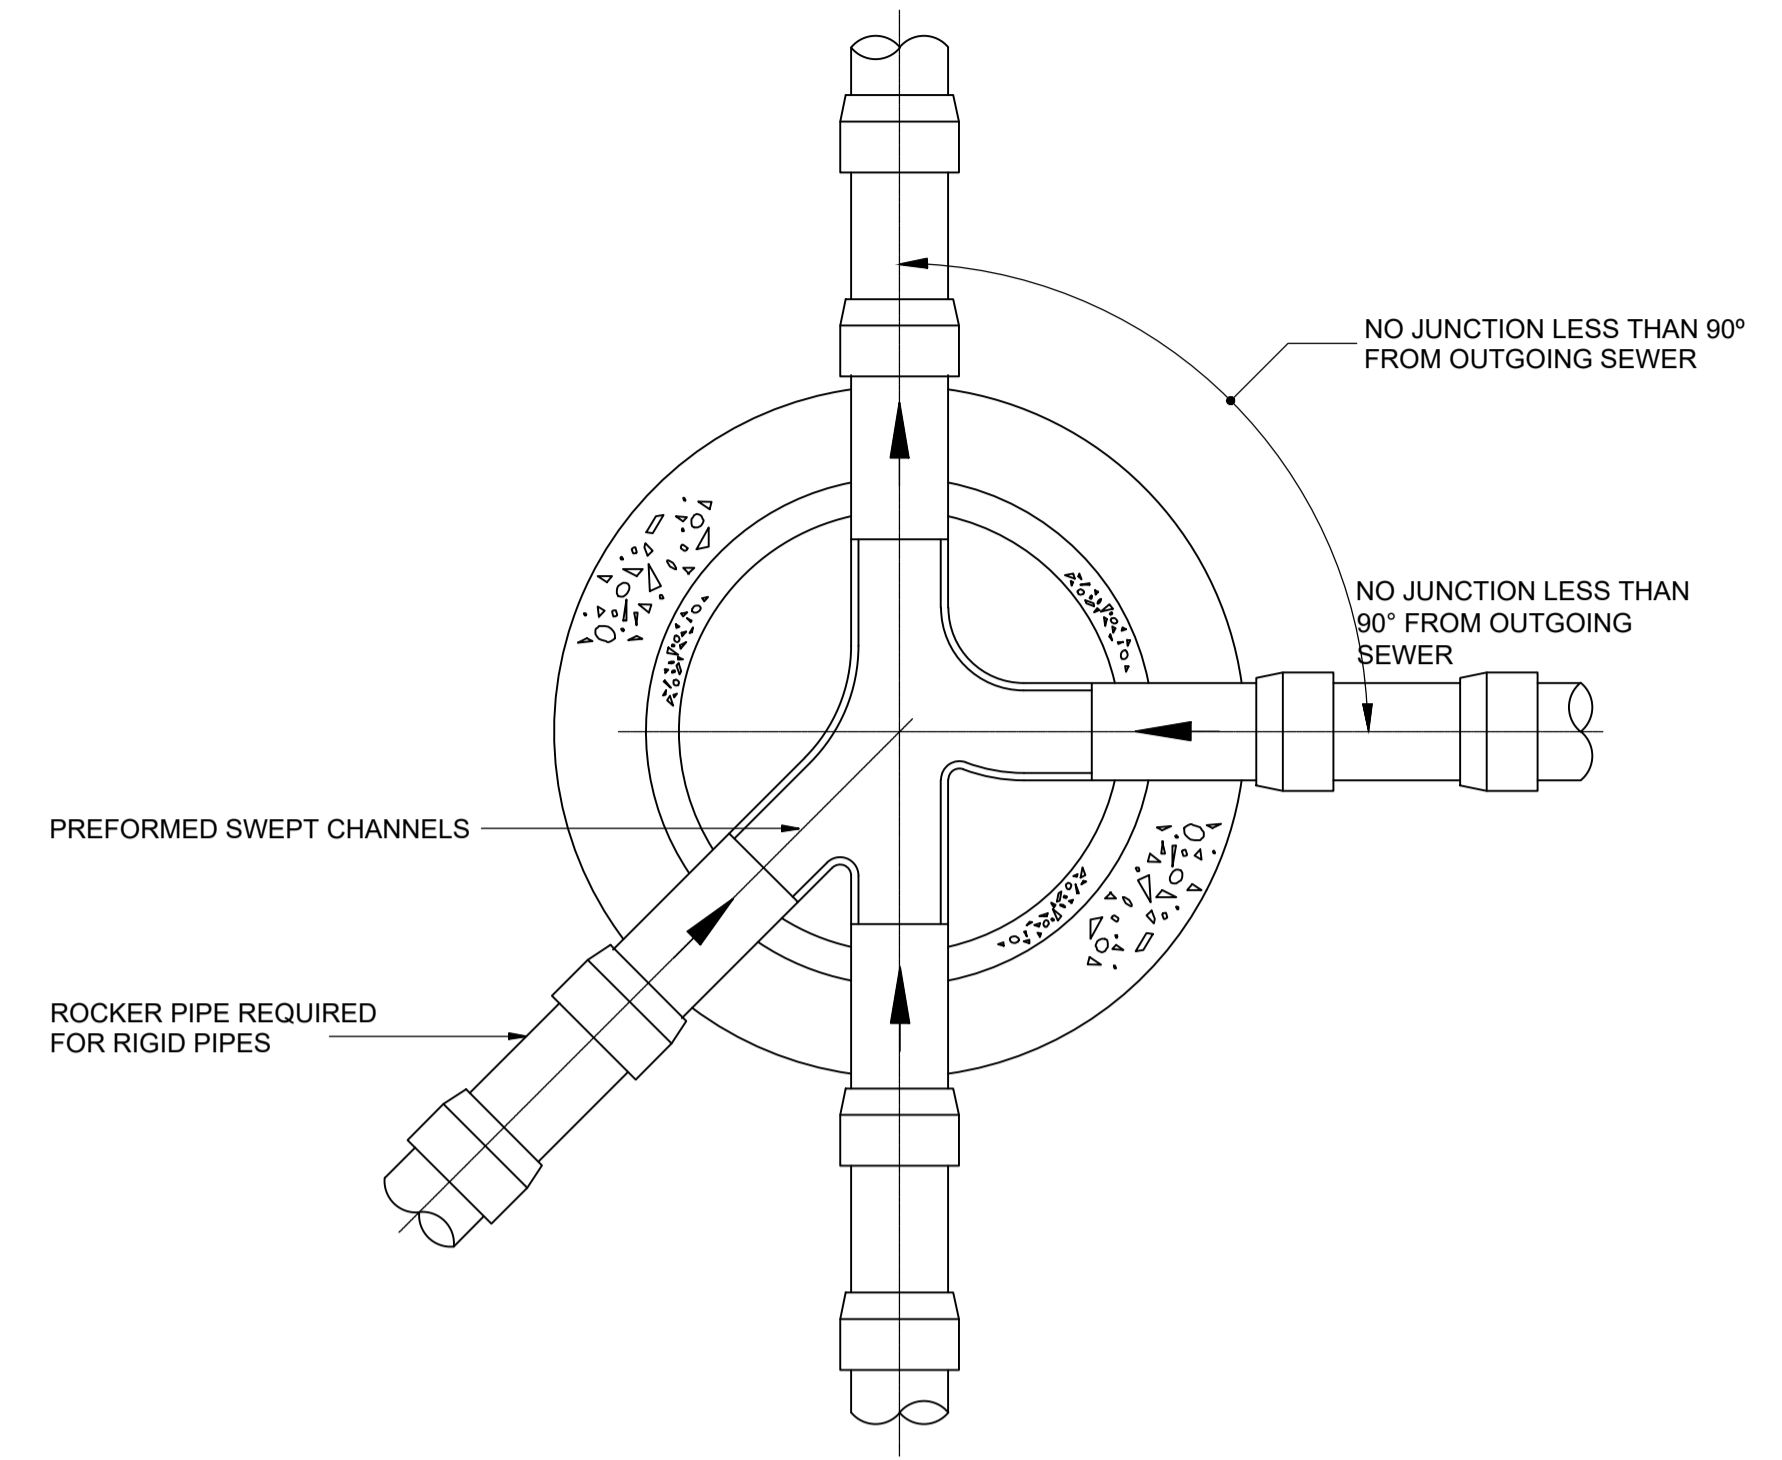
TYPICAL ARRANGEMENT OF PIPE JUNCTIONS WITHIN MANHOLES
